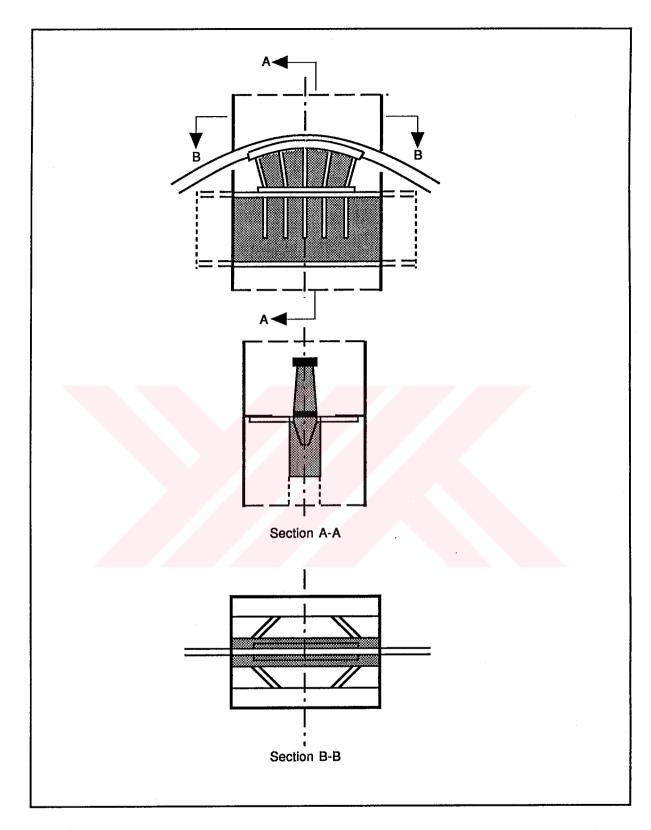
SADDLE SUPPORTED BY LONGITUDINAL GIRDER INSIDE THE PYLON
